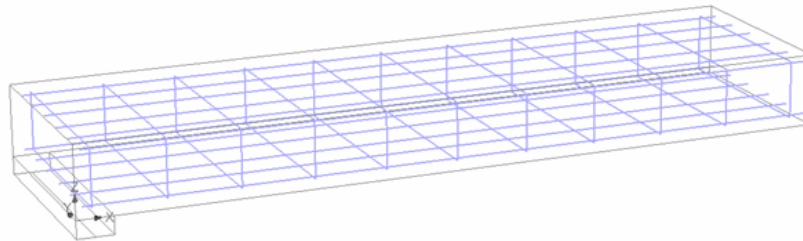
Symmetrical half of the hinge-supported version of the footbridge.
